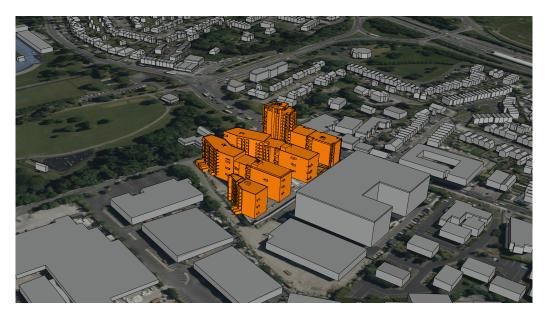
Buildings in the Proposed Scenario (Proposed development in orange, existing buildings in grey)
